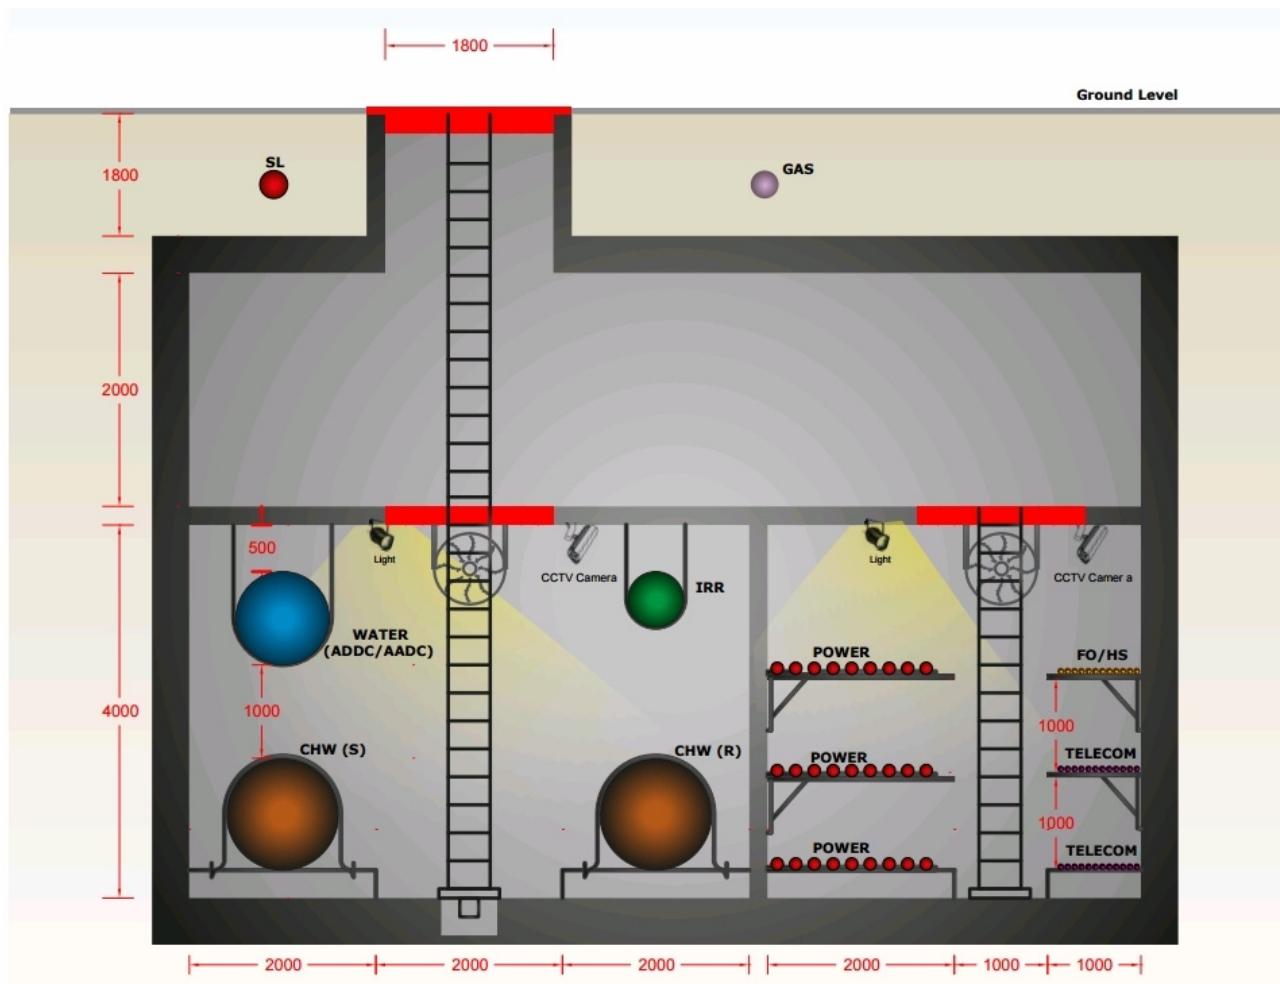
Typical Arrangement of Utility Tunnel Showing Manhole
